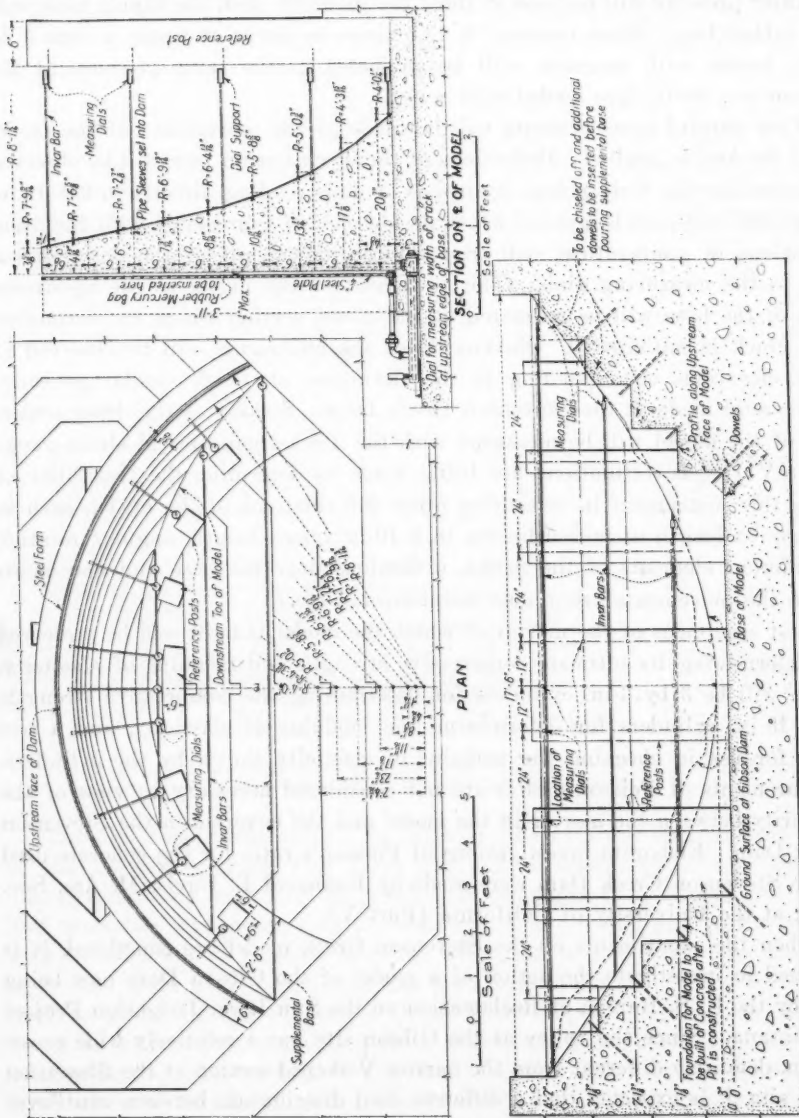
PLAN, ELEVATION, AND SECTION, GIBSON DAM.
